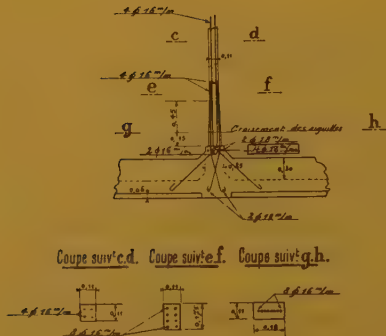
Ath station. — Suppression of the Pintamont street level crossing
